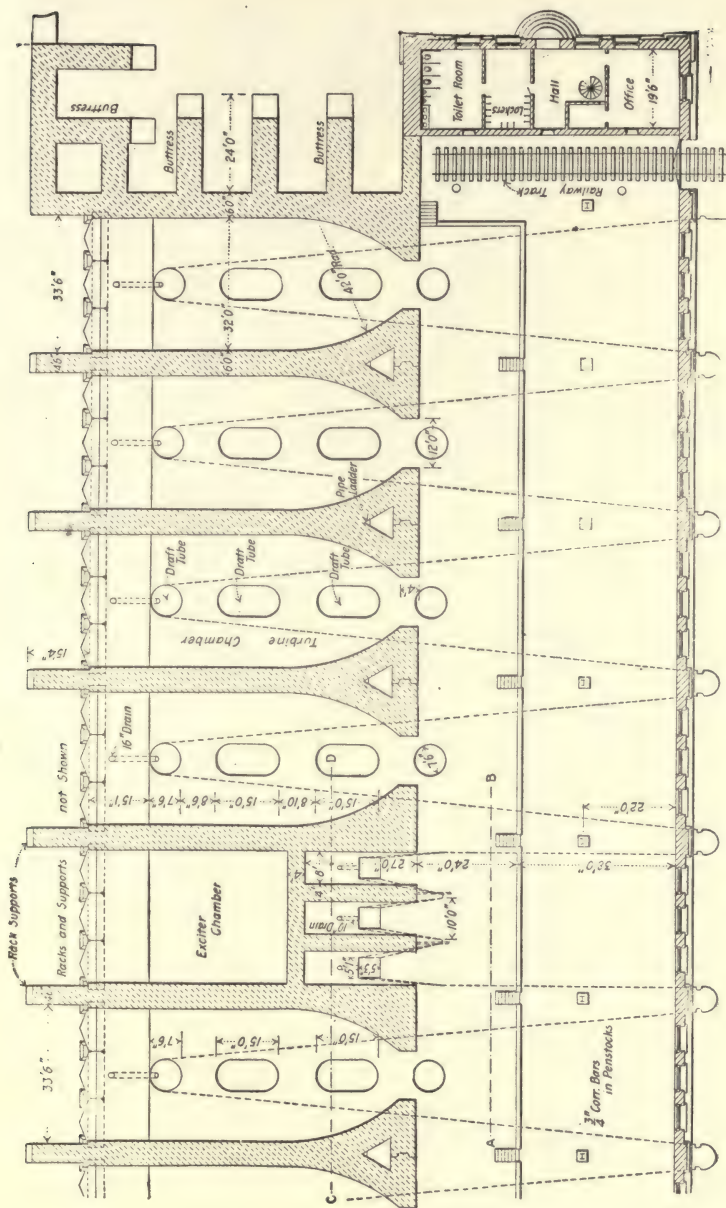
Plan of Power-house on Chicago Drainage Canal.
